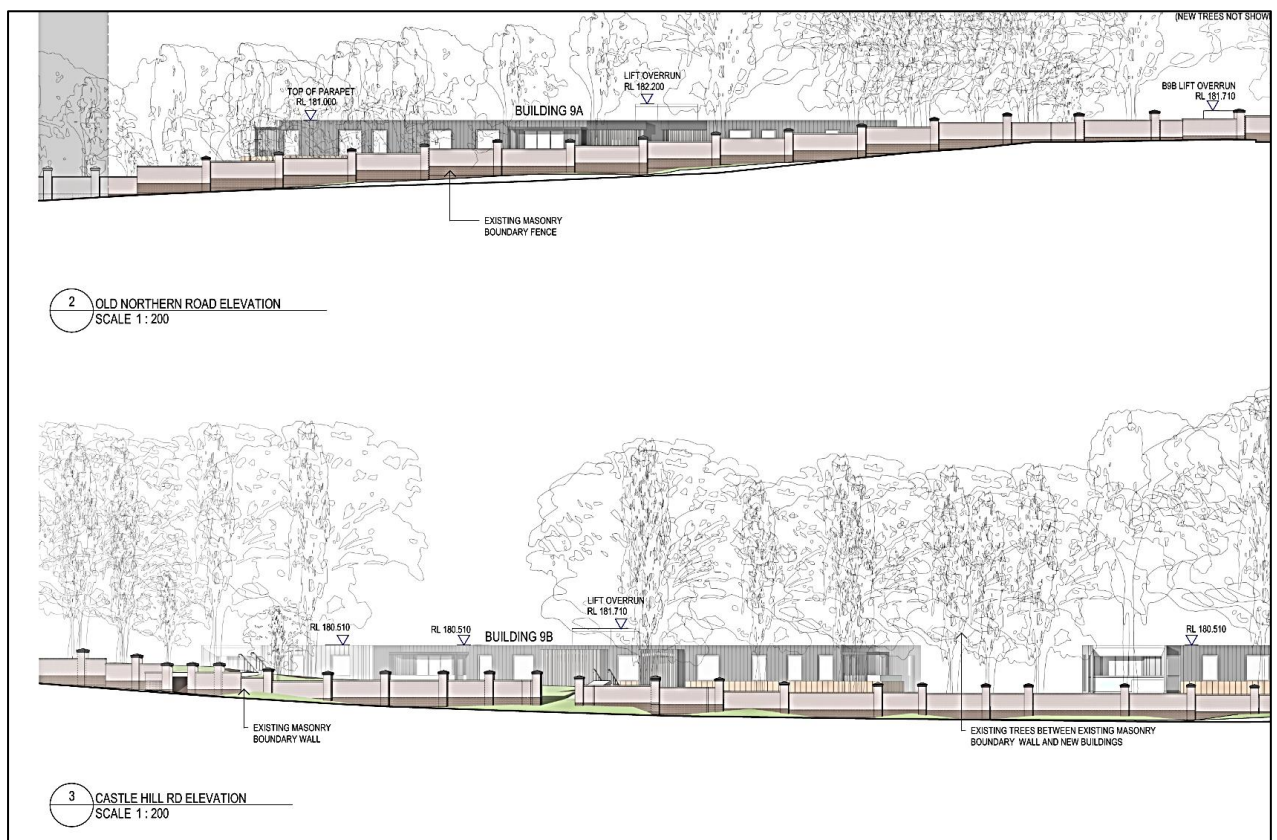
Elevations as viewed from Castle Hill Road and Old Northern Road of buildings 9A and 9B
